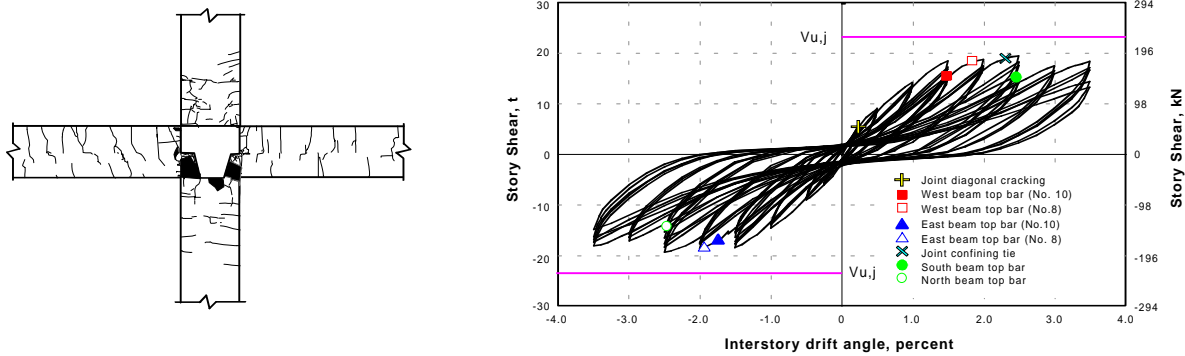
Final Cracking Pattern and EW Hysteresis Loops for Specimens J2
